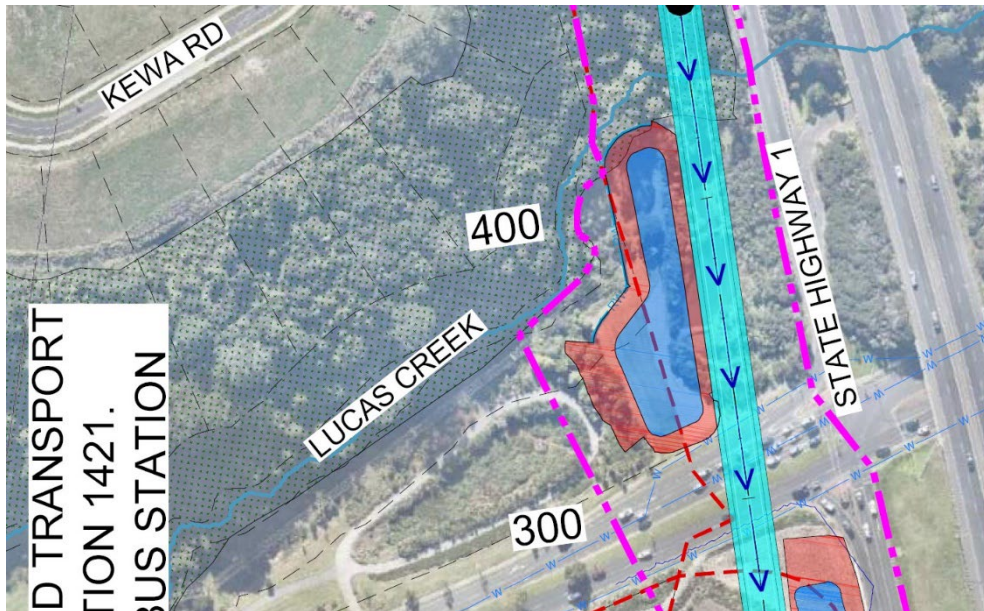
Extract from NOR1 GA plan. Stormwater pond shown in dark blue.
